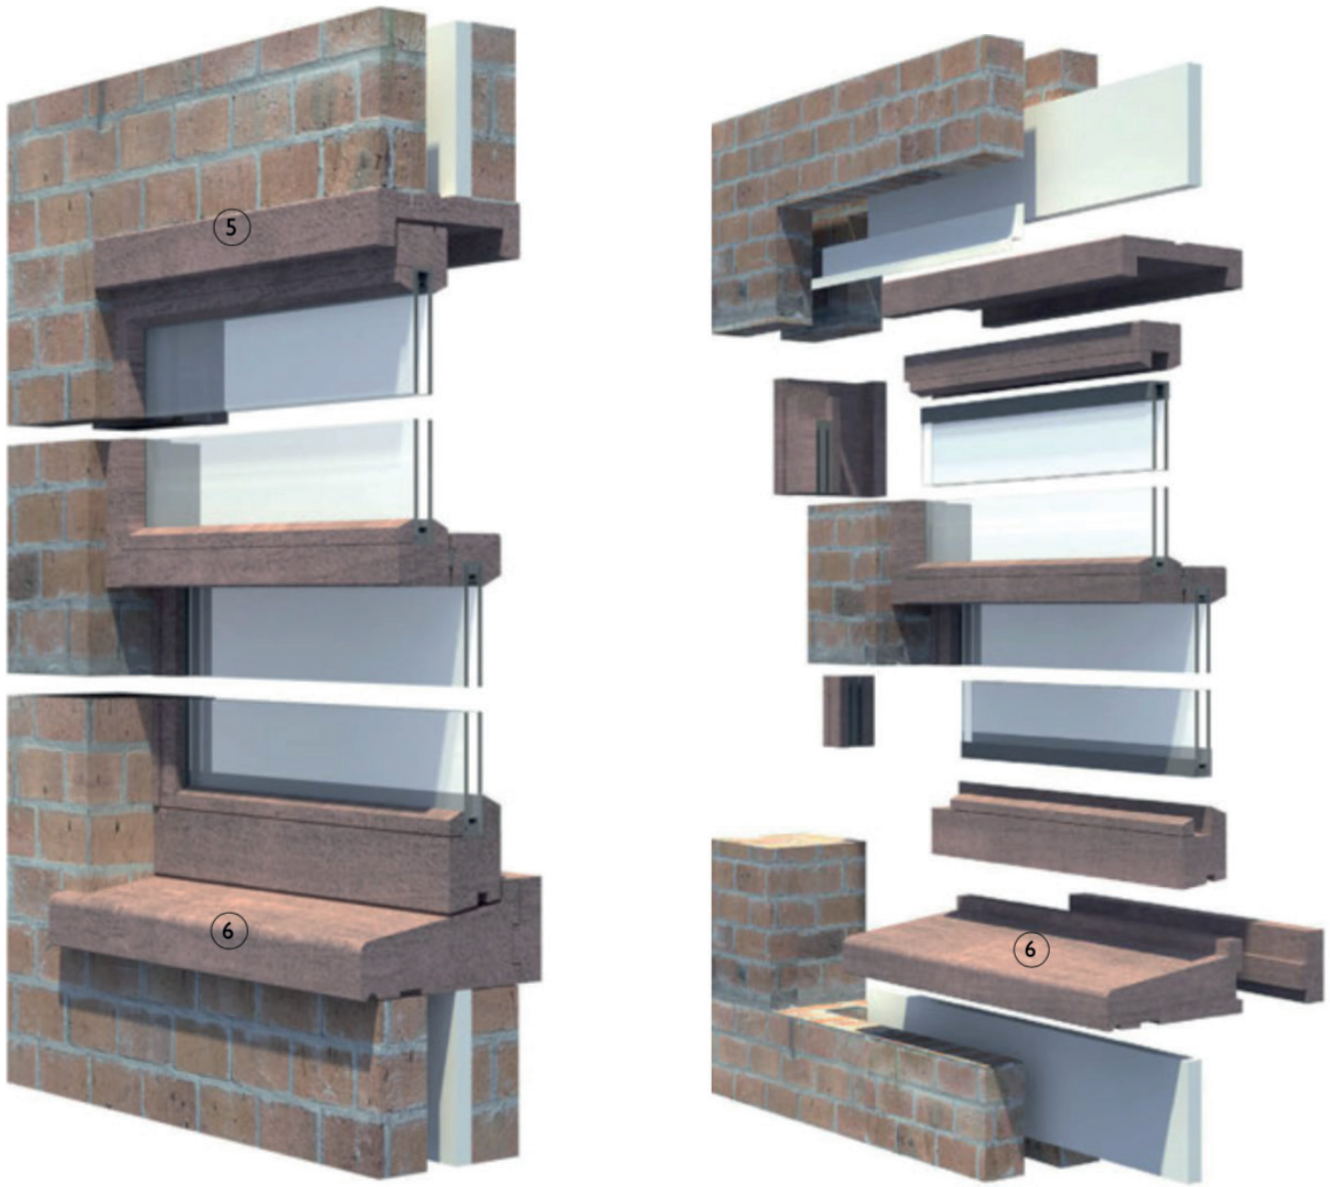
3D view of a wooden window in a brick cavity wall. Image by Watts (2014).
